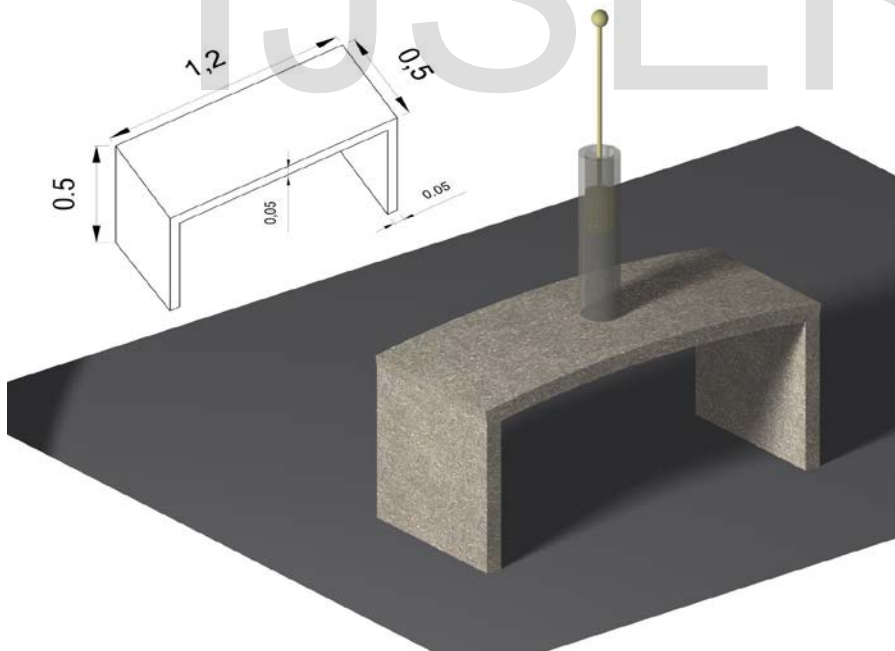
Impact Load of 4.5kg Falling 45cm on a Horizontal Reinforced Concrete Member
